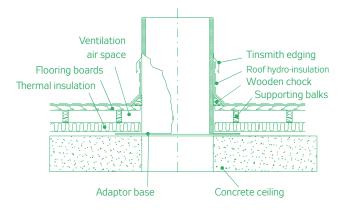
ROOF ADAPTOR ON A SLOPING ROOF
